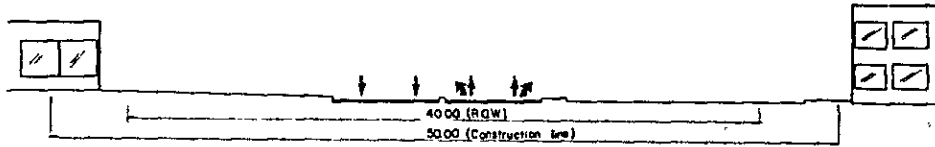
EXISTING CROSS SECTION OF VIA ESPANA(1)
